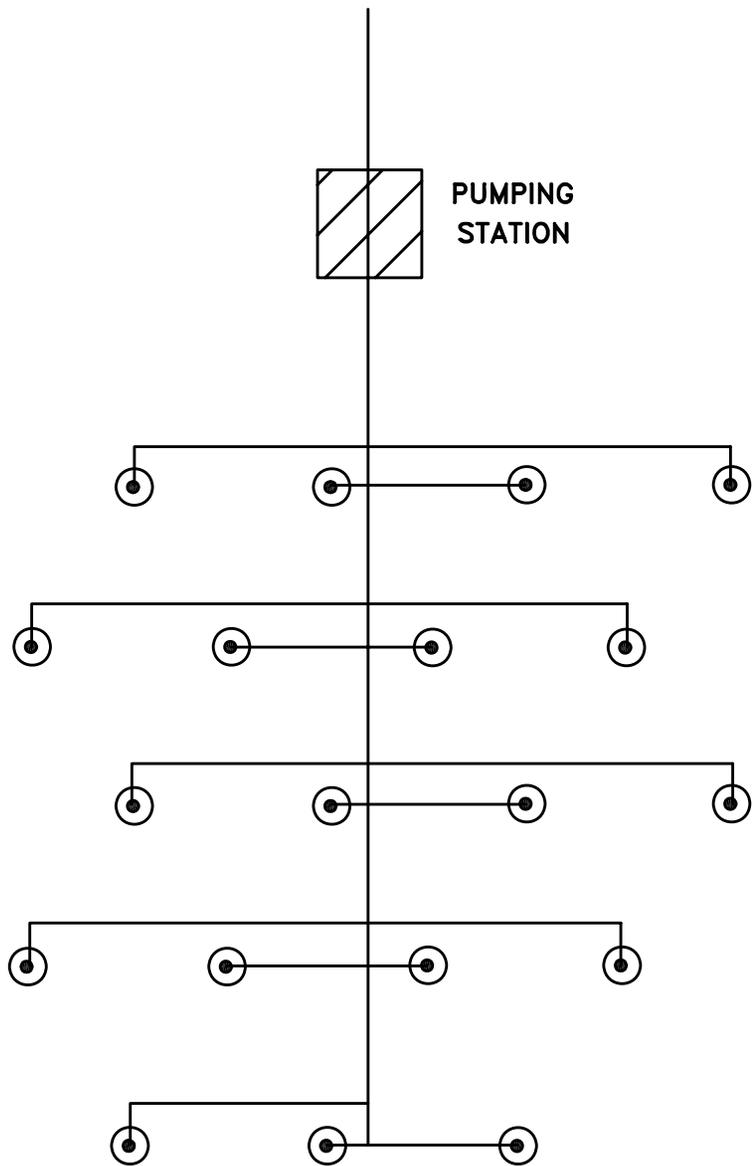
PLAN VIEW OF CONCEPTUAL RECLAIMED WATER ASR SYSTEM FOR GOLDEN GATE.
